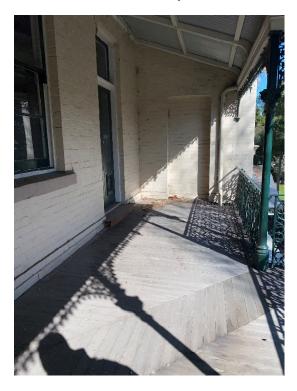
Room F17, bricked in doorway to Room F3B visible
